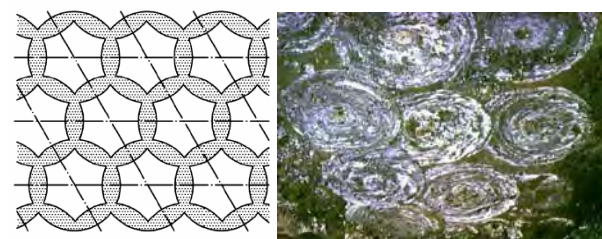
Block type pattern in dry mixing with overlapping columns.
